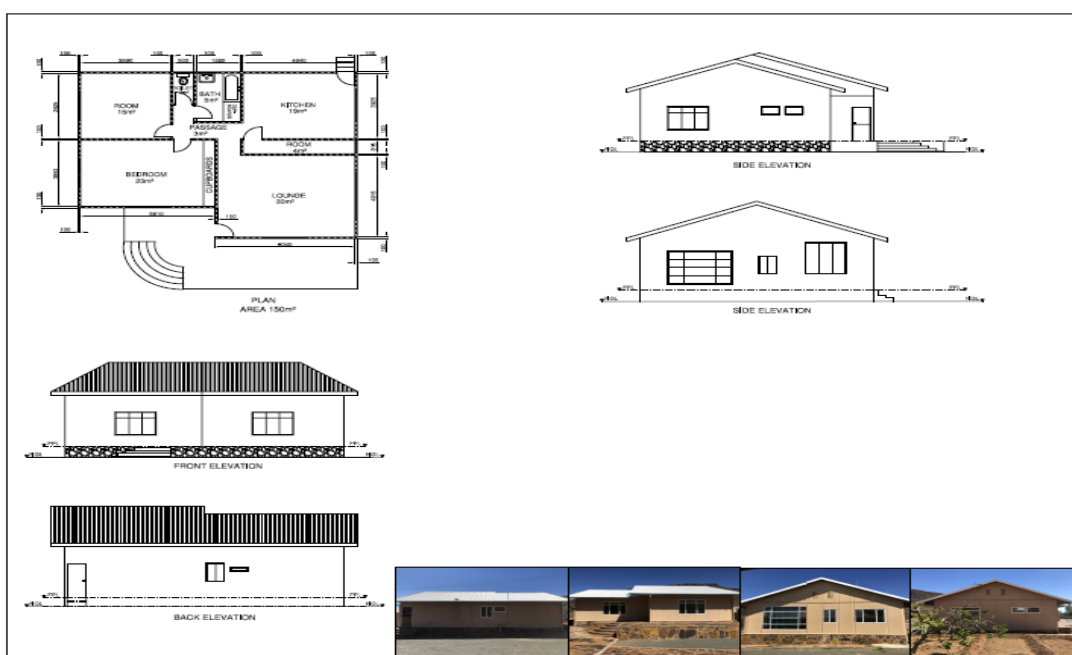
Jaskloof Farm Main Nutec Building - Existing Floor Plan and Elevations
